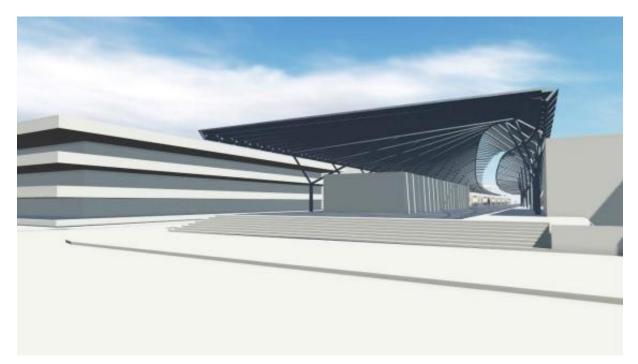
Conceptual architectural rendering of the new station from Stewart Avenue, Wickham
